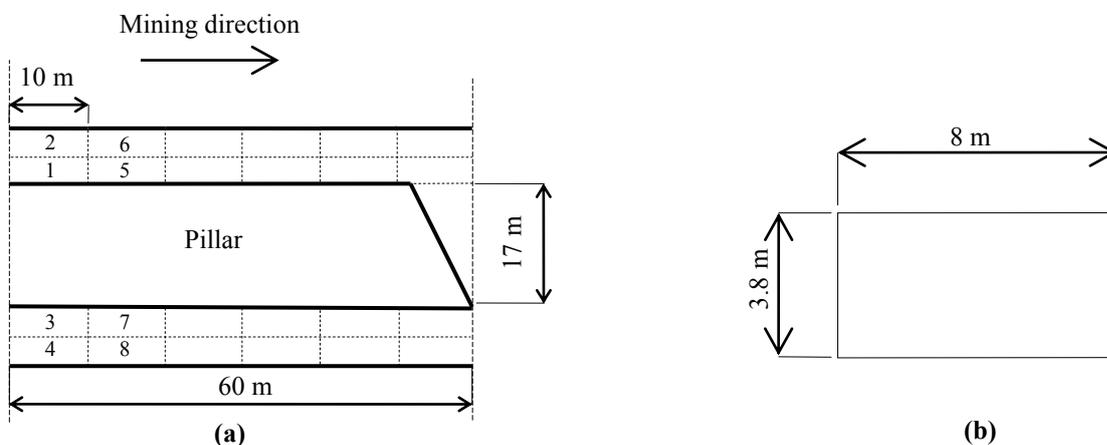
Geometrical model: (a) Simplified plan view of mine section showing part of excavation sequence; (b) Opening cross-section.
